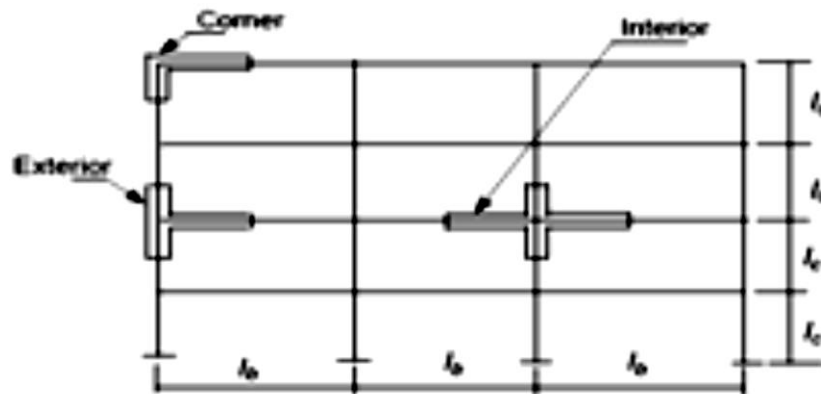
Typical frame with beam-column joints (Uma and Jain, 2006)
